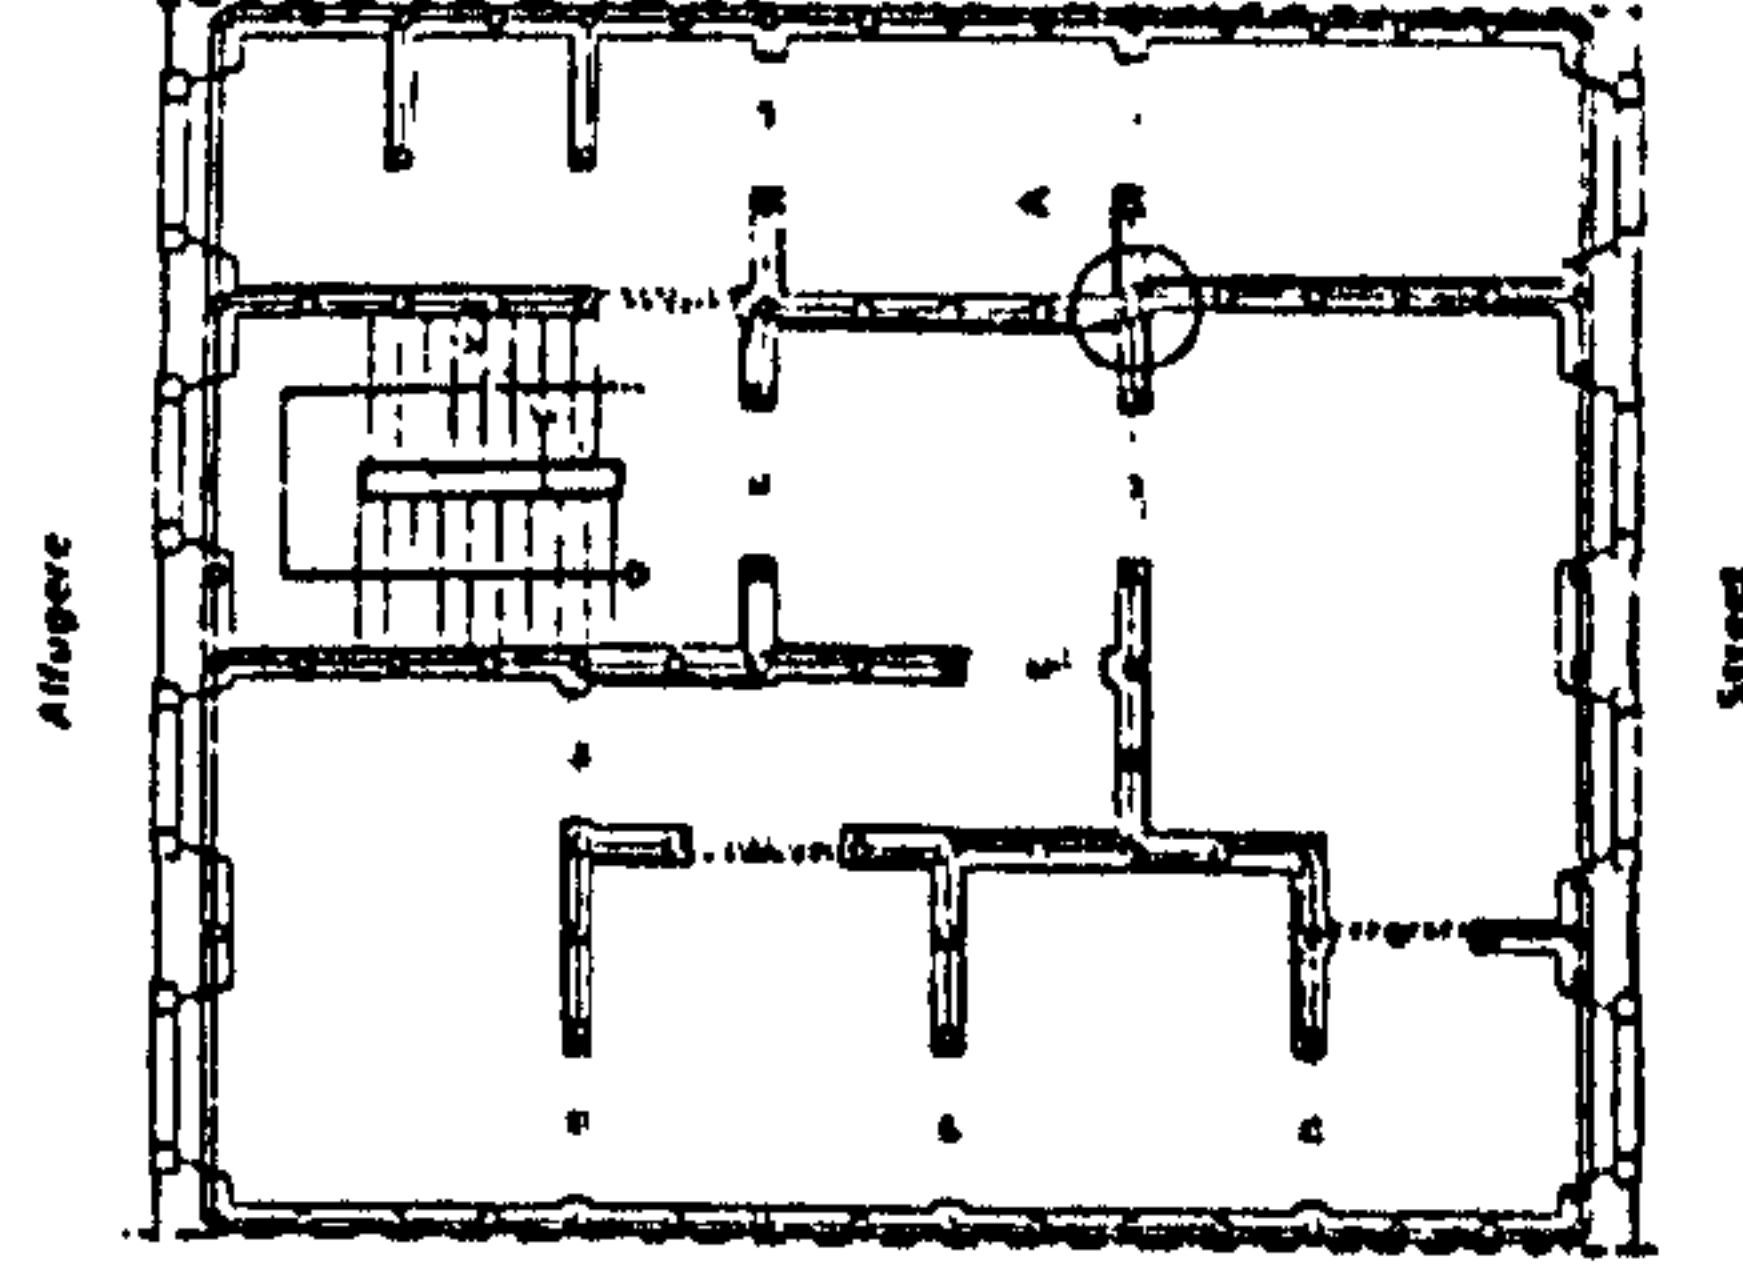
A variant of the module. Floor plan of no 110 São Nicolau Street. (Drawing by Jorge Mascarenhas).
